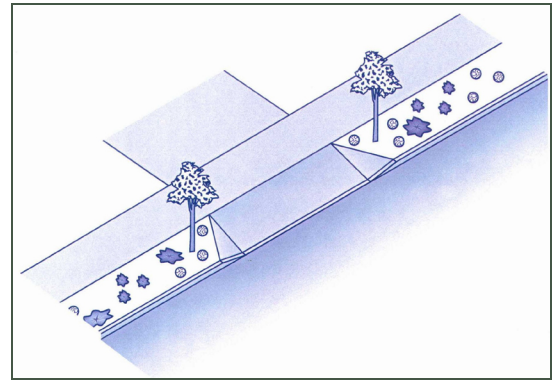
Driveway Apron Utilizing a Planter Strip
